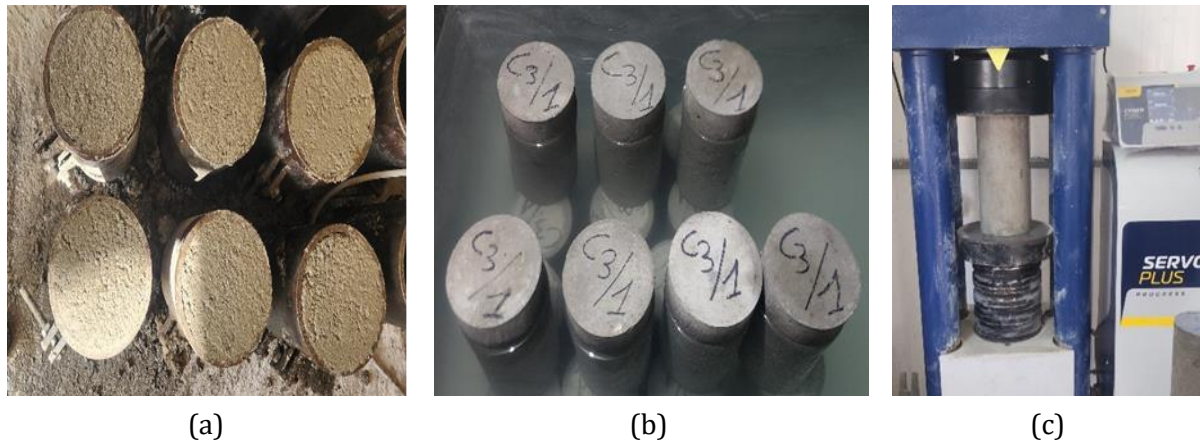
Stages of compressive strength testing of concrete cylinders: (a) concrete cylinders before curing, showing the initial casting, (b) concrete cylinders submerged in water for curing to ensure hydration, (c) concrete cylinders being tested for compressive strength using a hydraulic press
